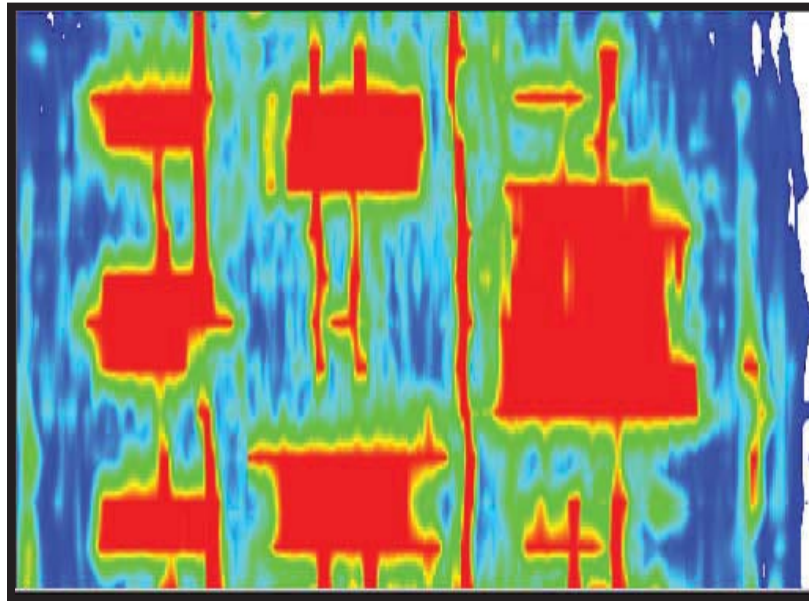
MIRA D-scan of the concrete slab with simulated delaminations, plan view sliced from 85 to 200 mm (3.3 to 7.9 in.) depth.
